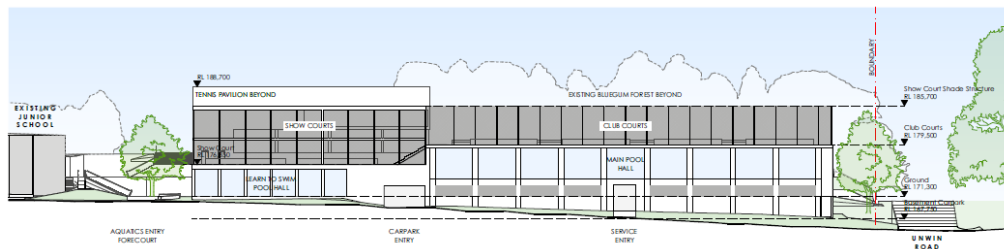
Proposed south elevation for the new Aquatics and Tennis Centre, looking north from Clarke Road. flag. (Source: Neeson Murcutt + Neille)
